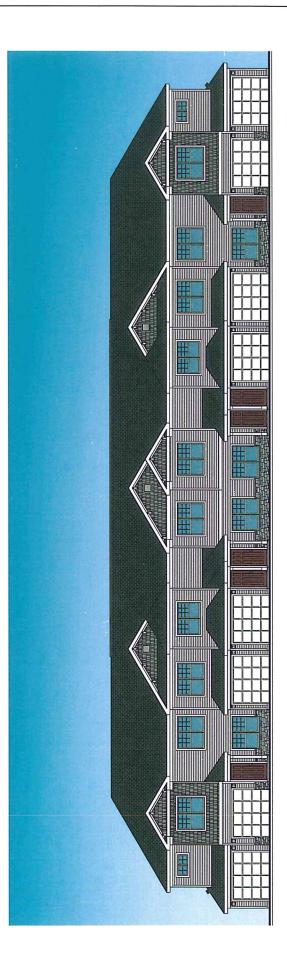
Conceptual Front Elevation Plan for Proposed Single-Story Buildings with Two Units and Eight Units Prepared by Daryl Martin Architect PC
